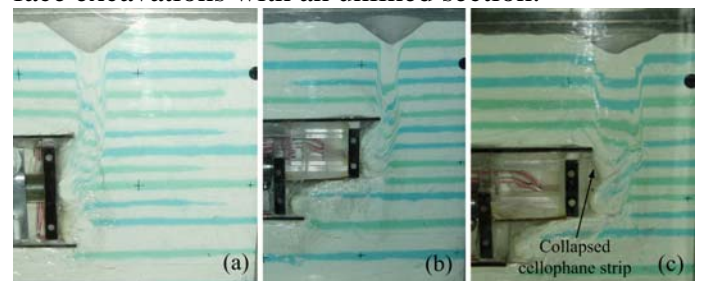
Deformation patterns at failure for tunnels with: (a) Full-face excavation; (b) Staged excavation; (c) Staged excavation with an unlined section.
